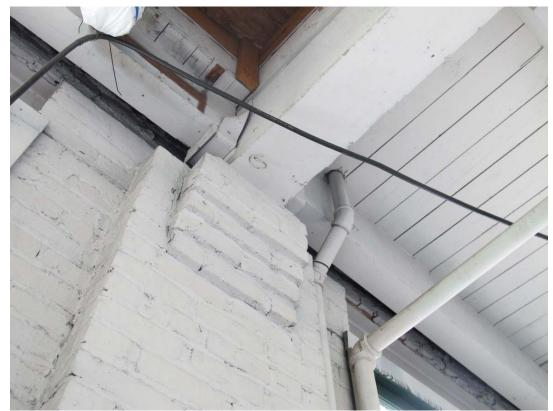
Interior, second floor, north part, detail of beam at corbelled wall pier connection
